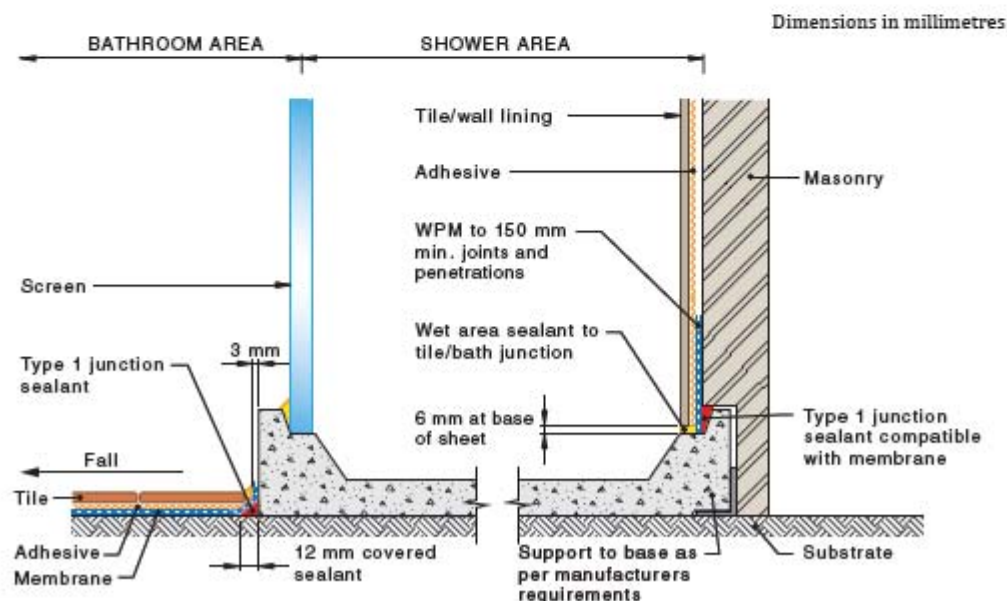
(B) — Section through rendered masonry wall and preformed or cast shower base
